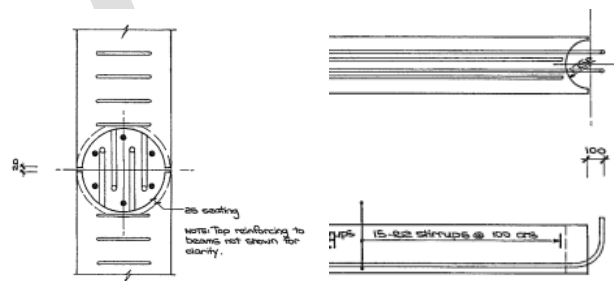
Typical bottom reinforcement anchorage in interior beam column joint zone (Design Engineer 1986a)
